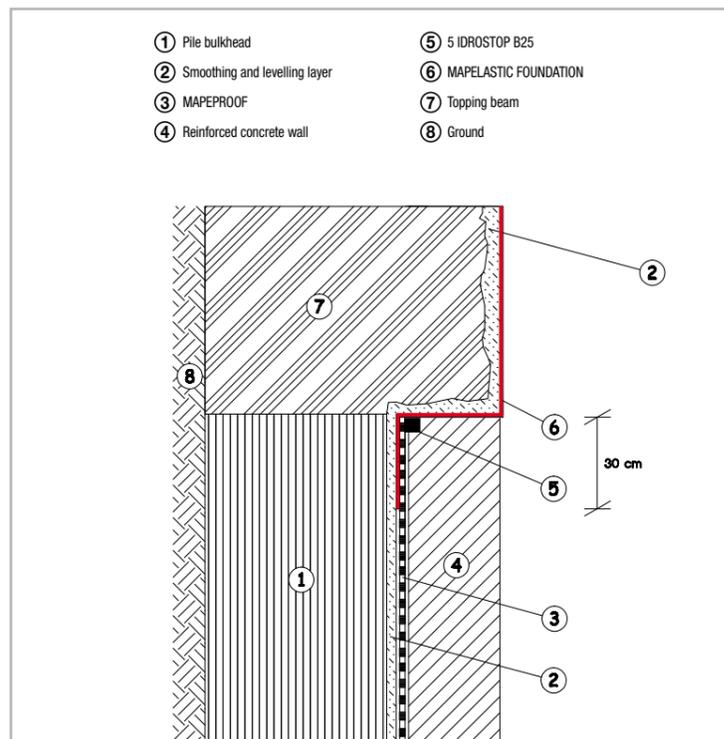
Waterproofing the topping beam on a bulkhead
